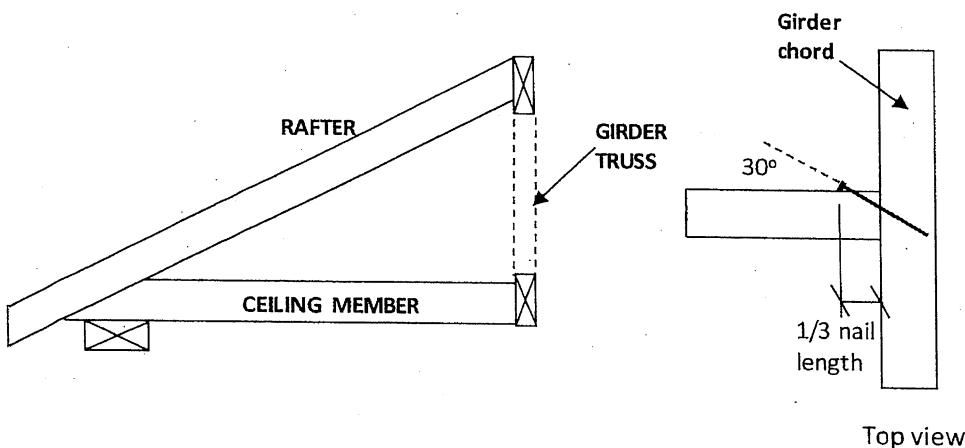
Toe-Nailing Rafter / Ceiling Member to Girder Truss
